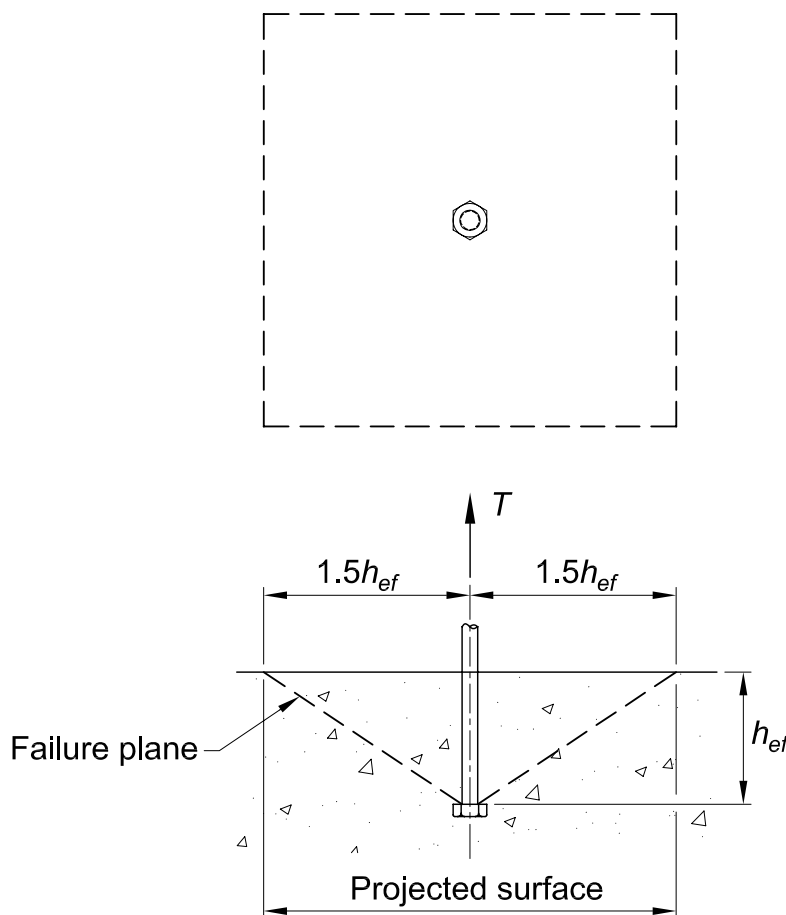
Concrete truncated pyramid subject to breakout.
